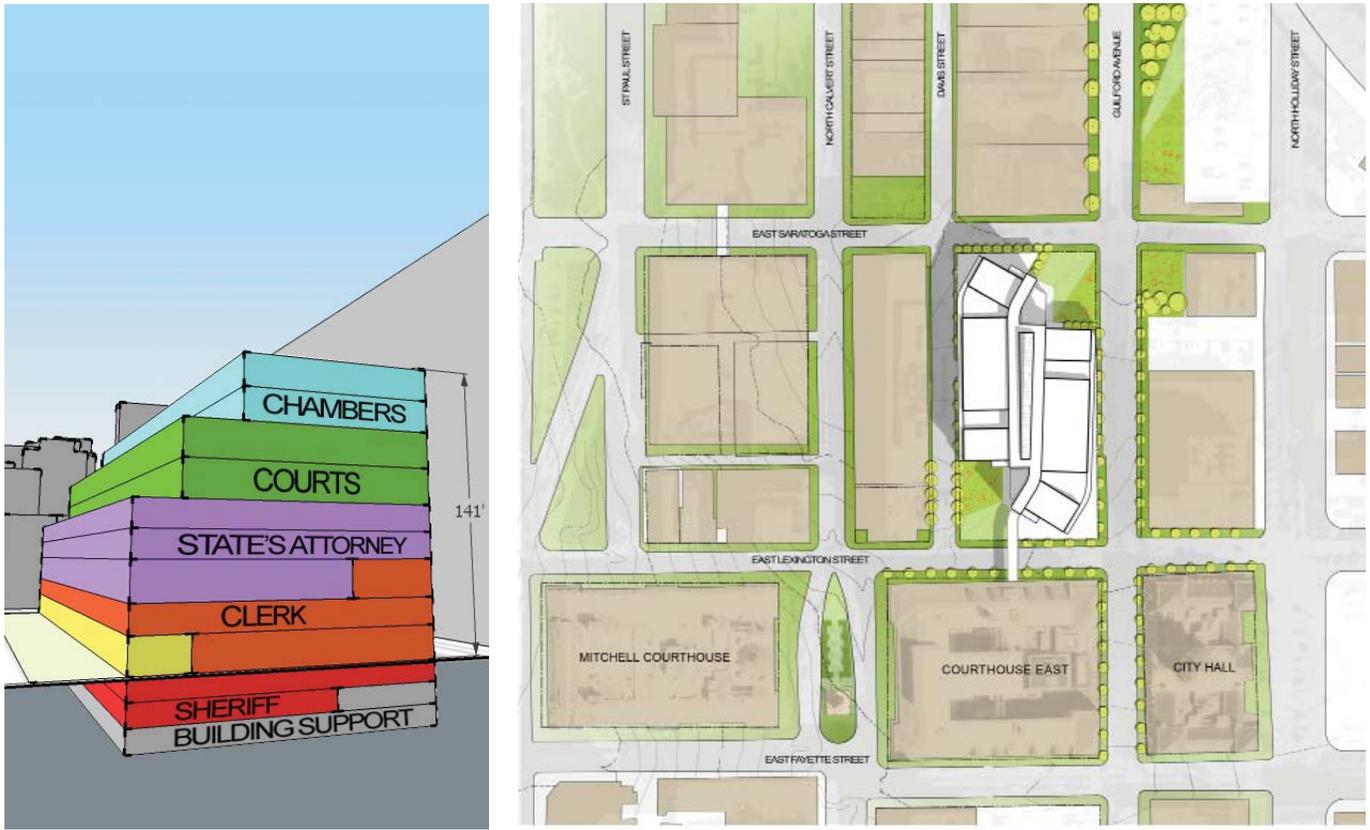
Option C: North Site / Proposal for 8 courtrooms per floor
